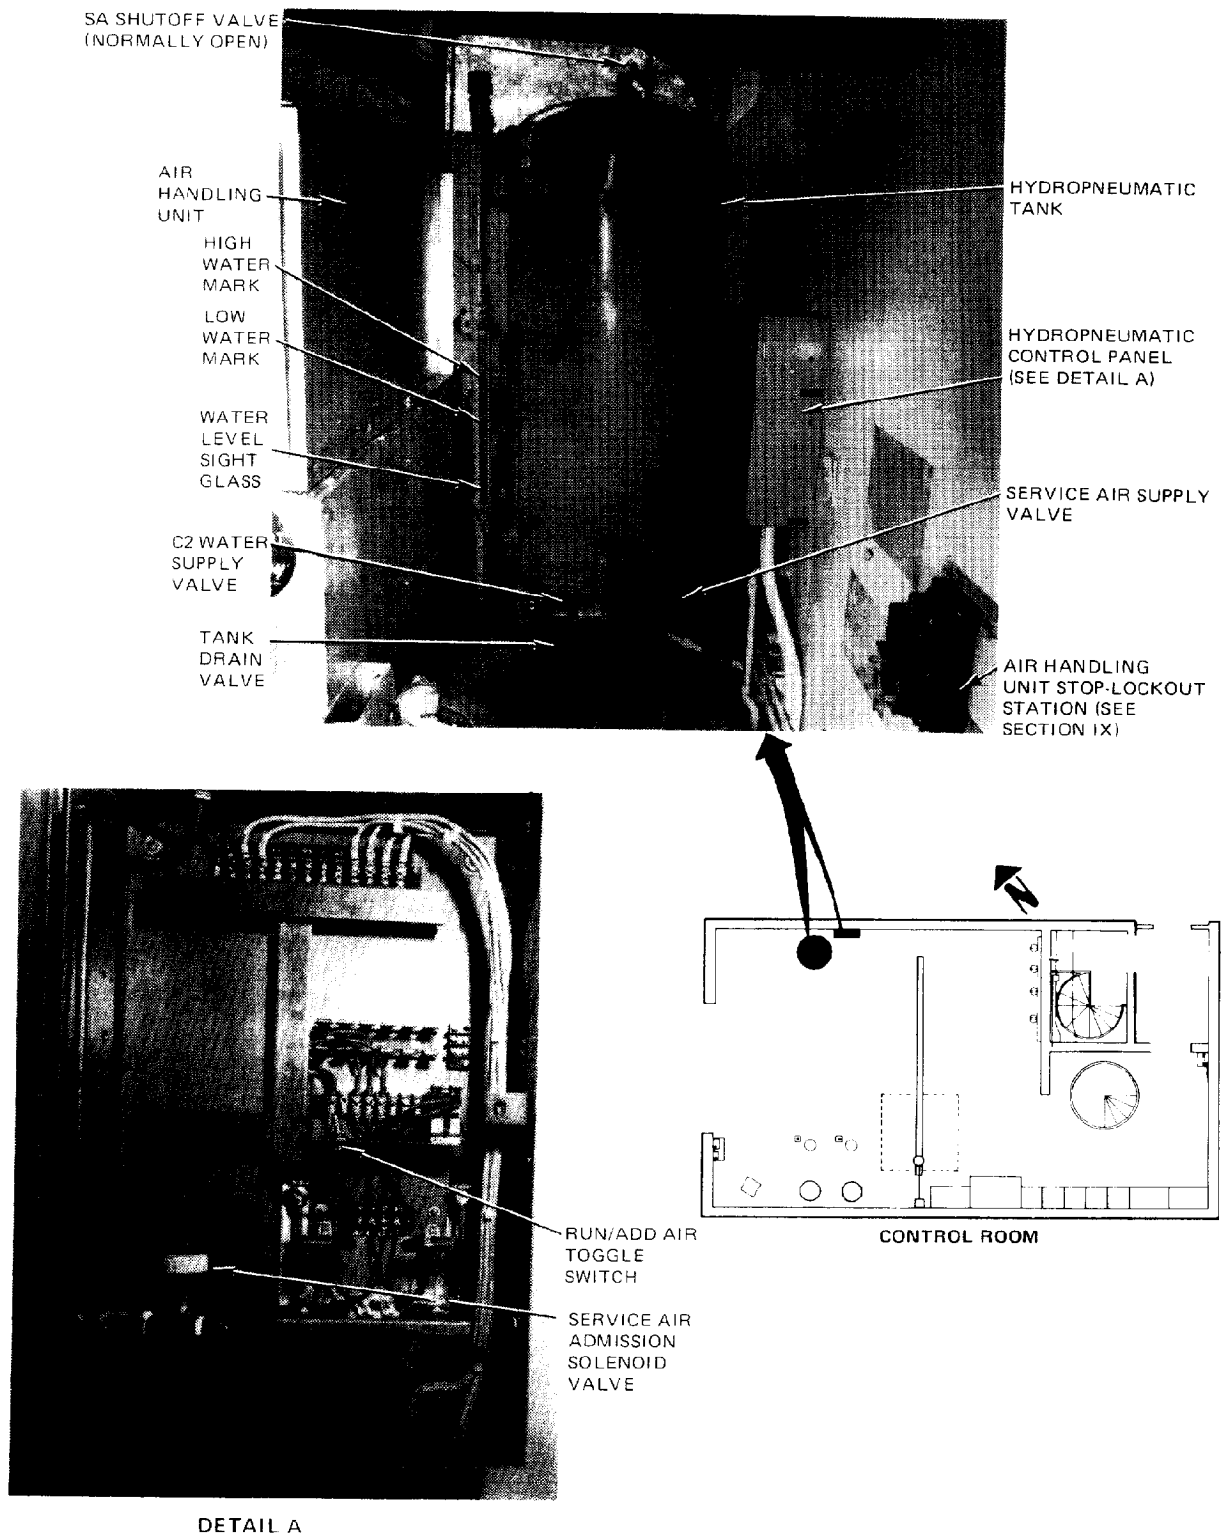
C1 and C2 Water Systems Equipment (Sheet 2 of 3)
